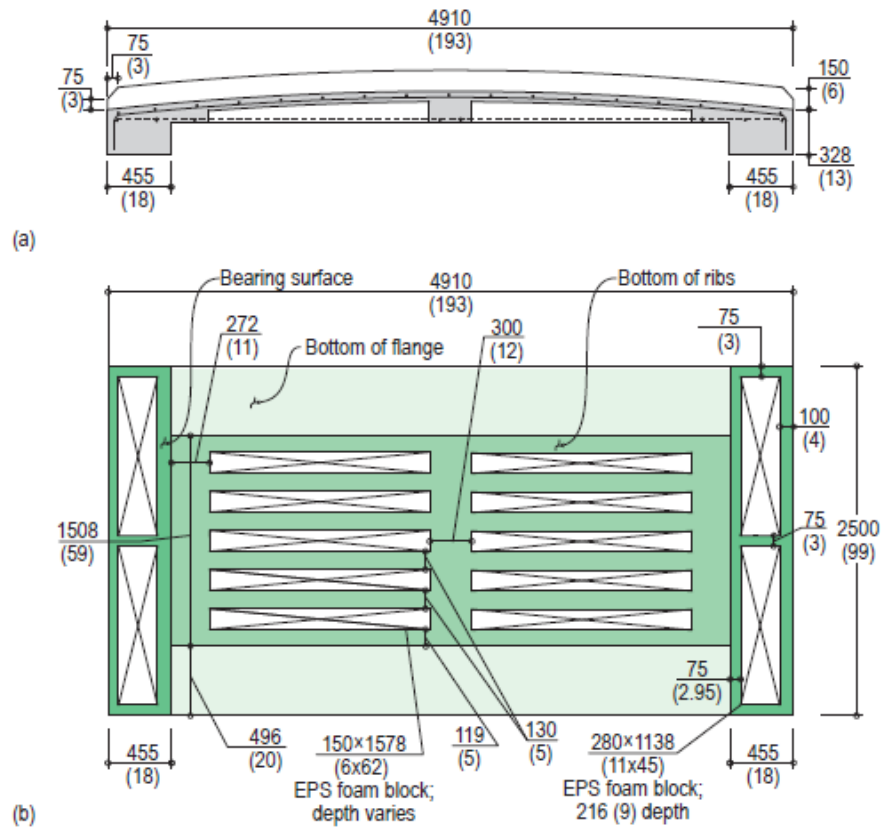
Bridge schematic: (a) longitudinal section at centerline and (b) bottom view showing concrete dimensions. Dimensions are in mm (nearest in.)
